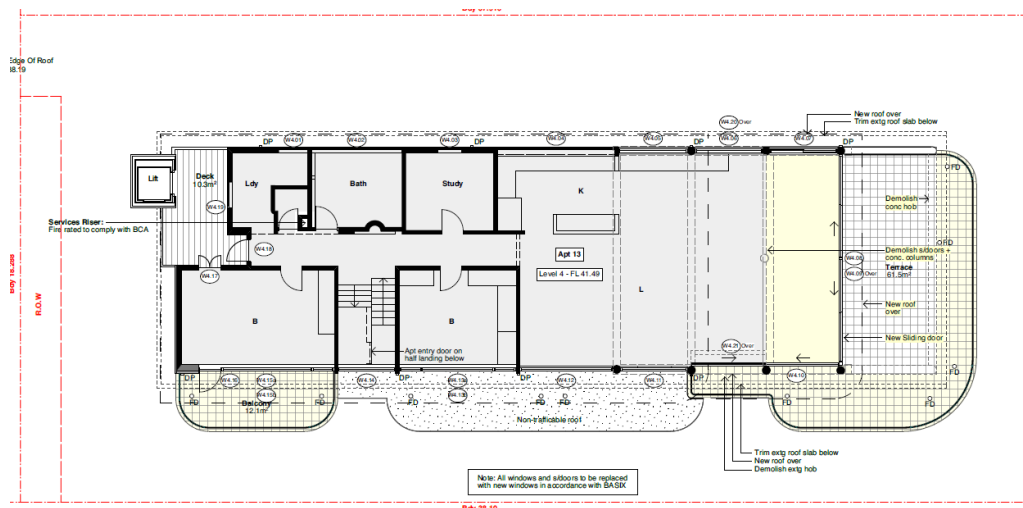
Proposed fourth plan – 10 Major Street, Coogee (Source: Ken Powell Architect)
